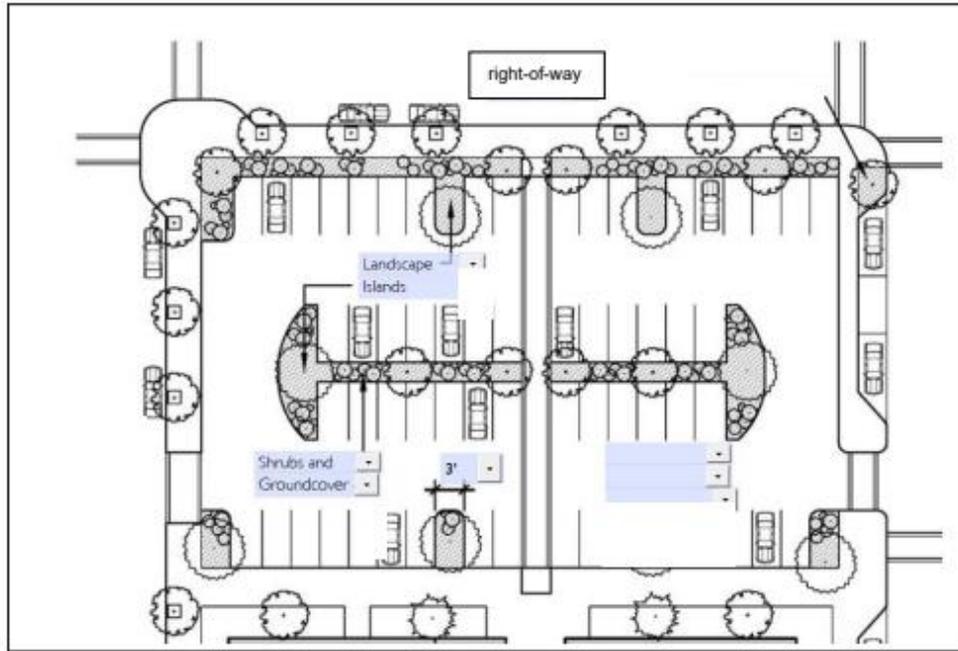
Example Parking Lot Landscape Layout (related to Section 3.120.B)
